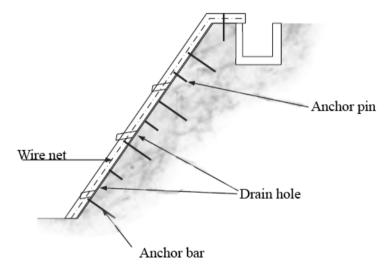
Typical Example of Mortar or Concrete Shotcrete
